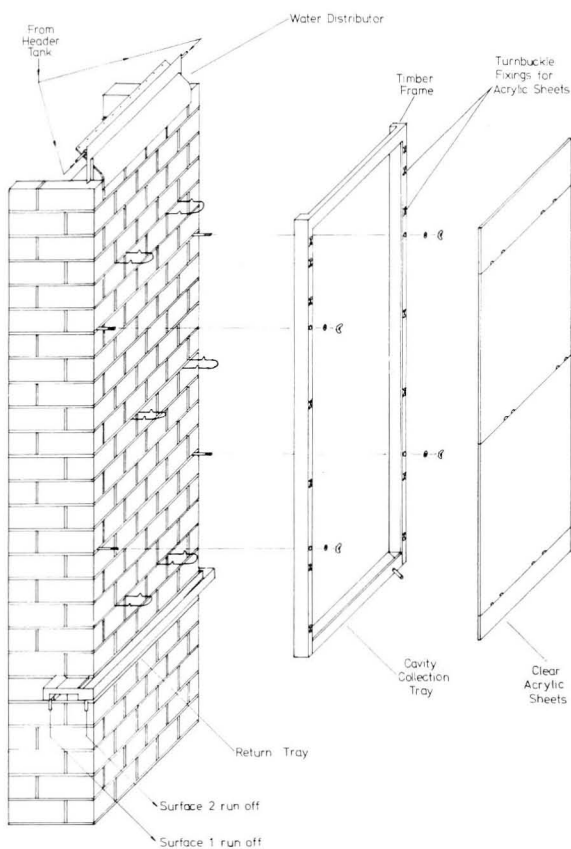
Free-standing masonry wall and associated insulation retaining frame for Mode 2 standard test. Clear acrylic sheets provide surface 3.
